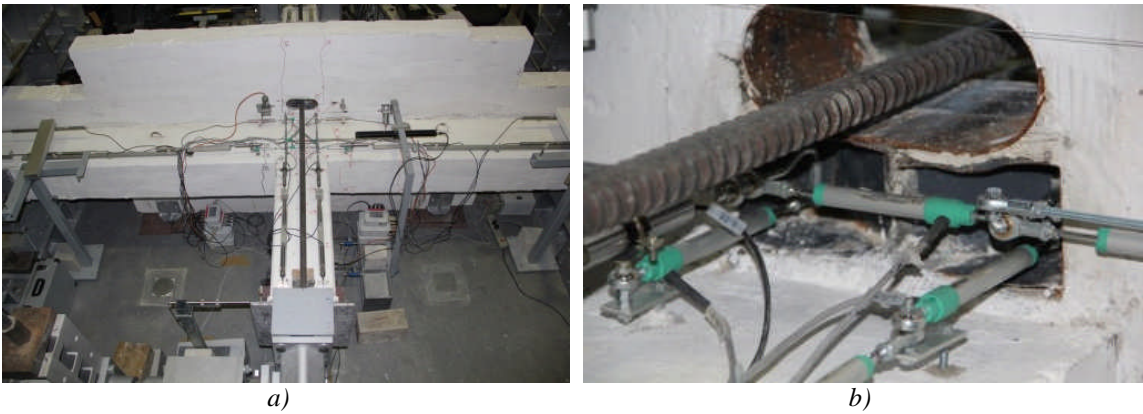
a) general layout of the instrumentation of specimen J4-X; b) detail of the mounting of the potentiometers inside the slab-beam-column interface.
